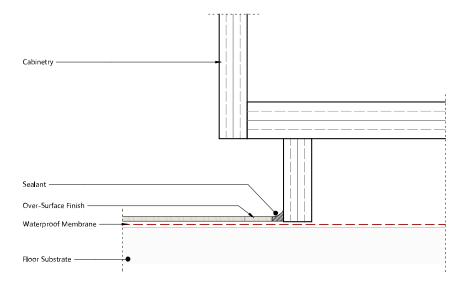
Waterproof membrane system and timber flooring installed after cabinetry
